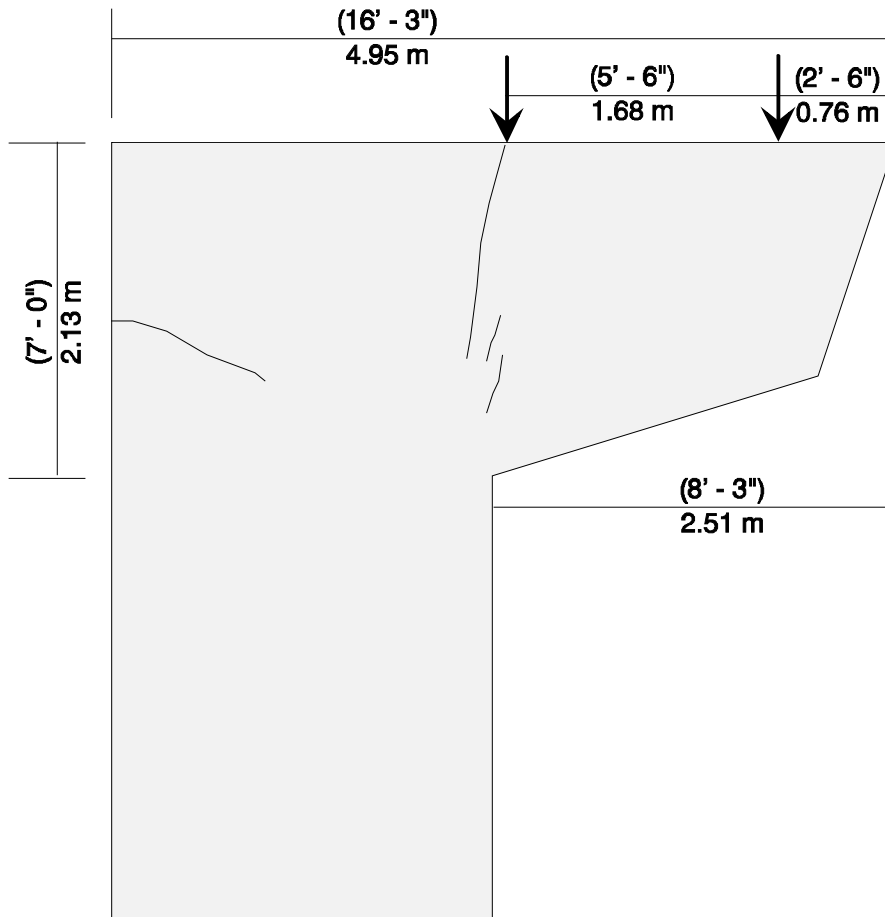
Pattern of Cracks in Pier I-3C
